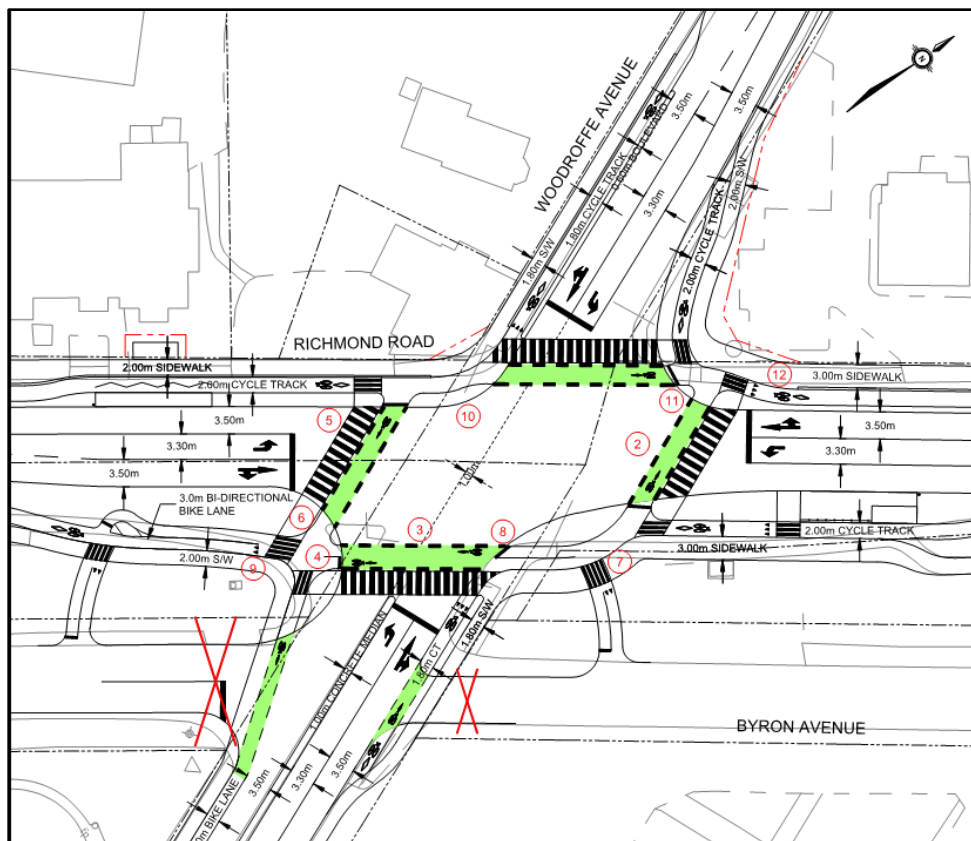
Richmond Road Complete Streets - Woodroffe Avenue
